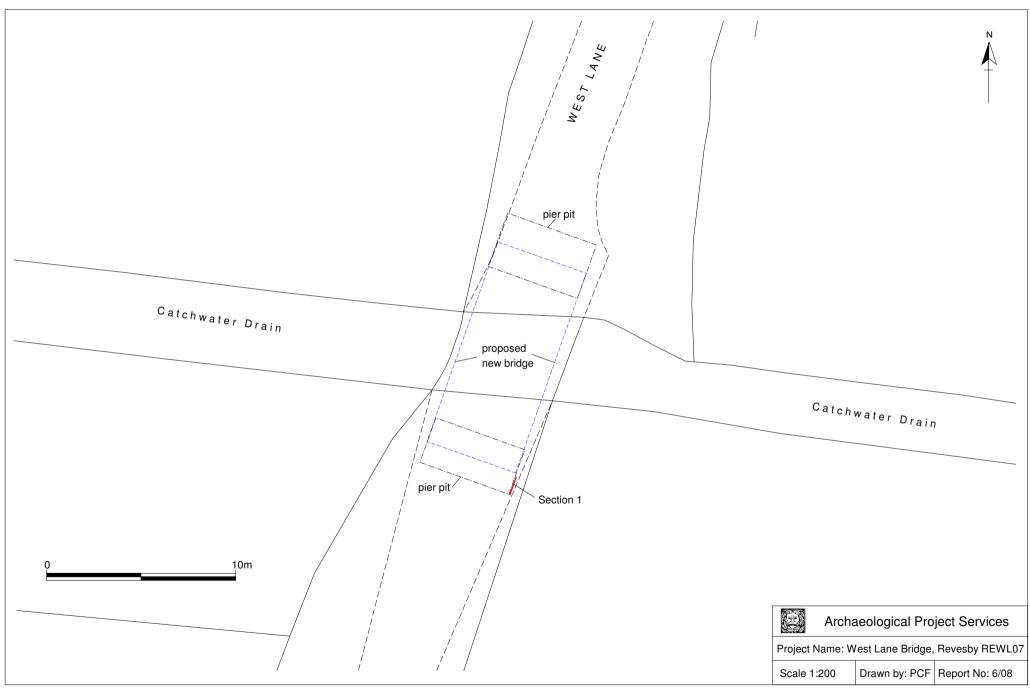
Plan of the development showing location of bridge pier pits and drawn section
